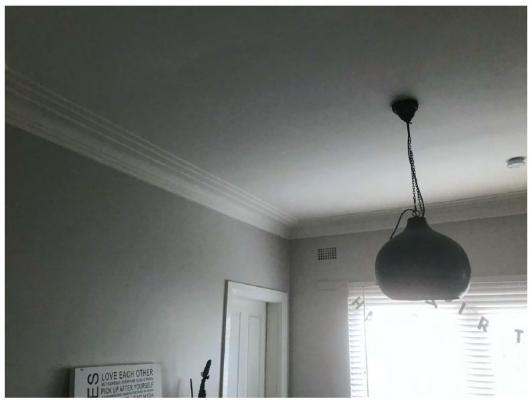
Modern living room ceiling (Corona Projects, 2021)
